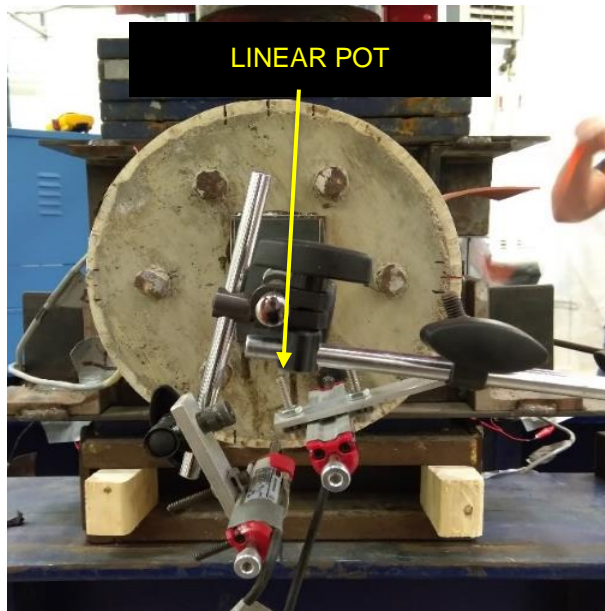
Slip measurement between concrete-steel reinforcement-GFRP tube
